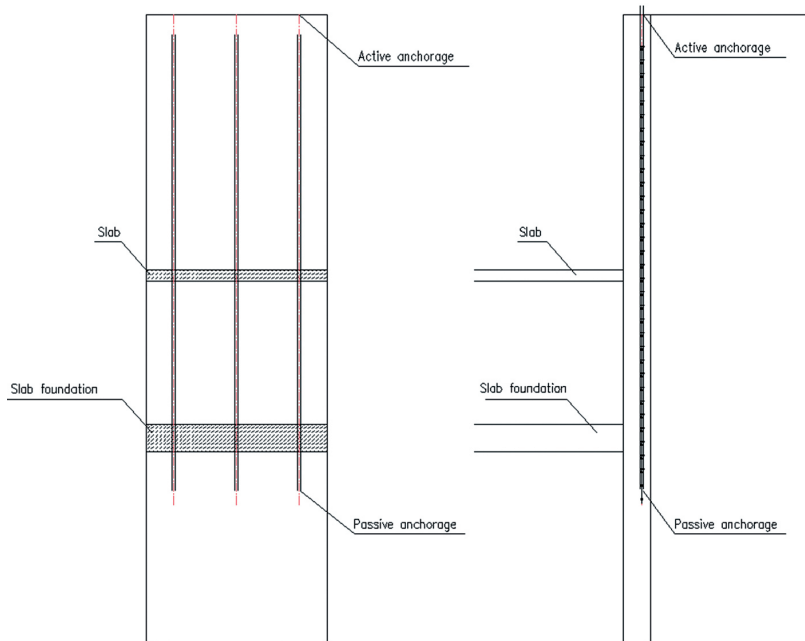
Cross sections of the method described for one section of the shear wall with three prestressing tendons installed. In the presented case, prestressing tendons were installed linearly, i.e. parallel to the external wall face [own source]
